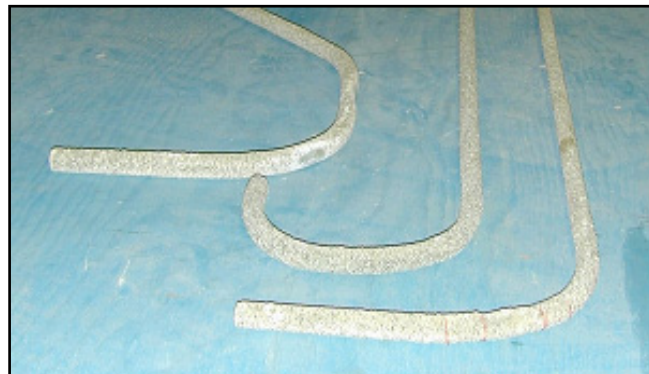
Bends in Glass FRP rebar reinforcement for concrete barrier wall (courtesy Vector Construction Group).
